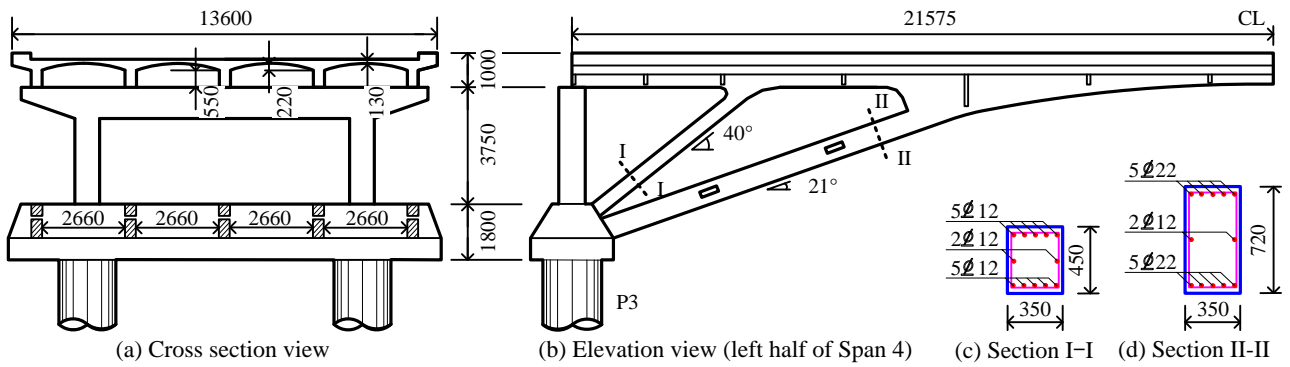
Configuration of Xiaoyudong Bridge (unit: mm)
